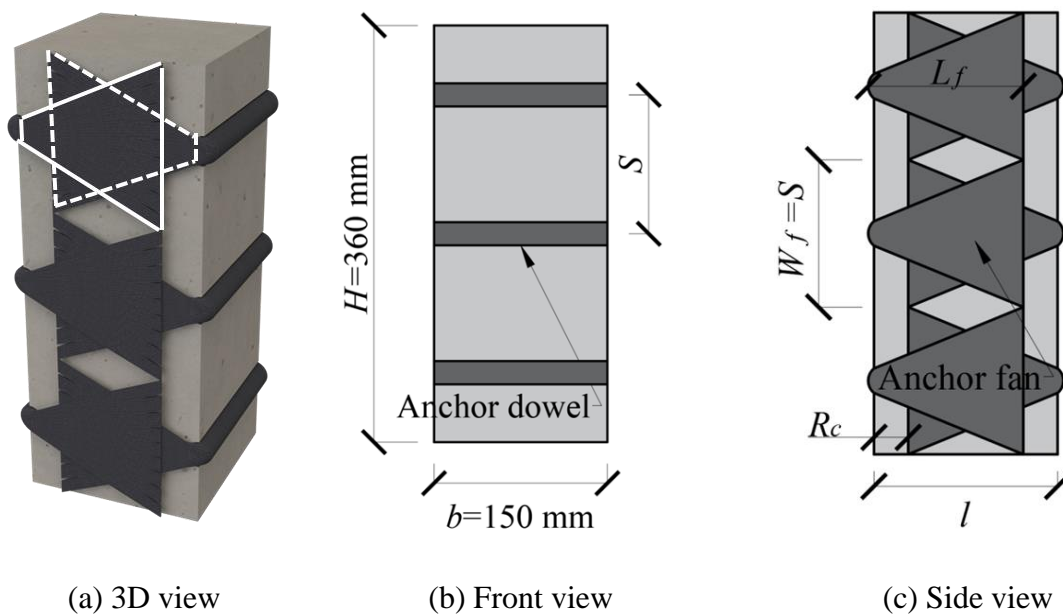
Drawings of concrete test prisms confined by FRP anchors on two sides (confinement type B)
